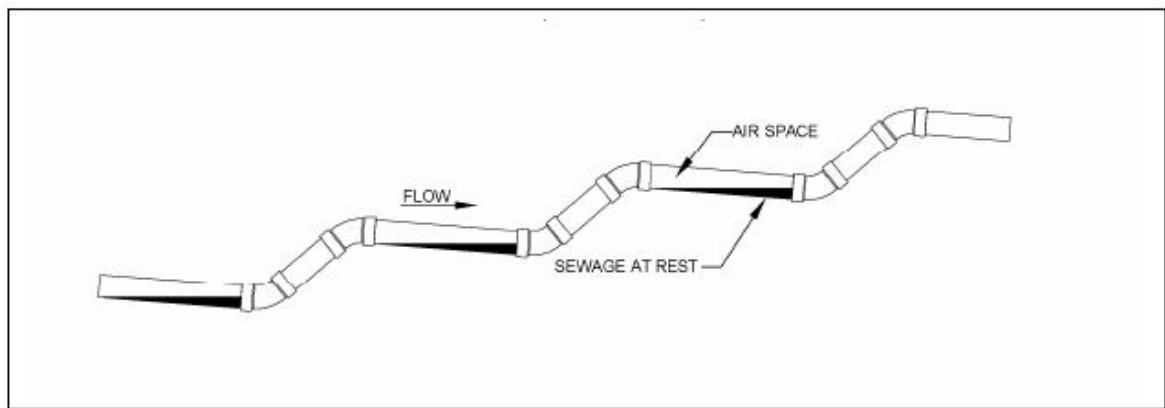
Typical Vacuum Sewage System Reformer Pocket Design (PDHengineer, n.d.)
